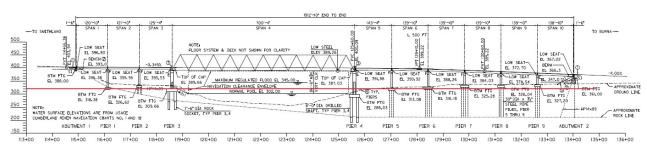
Bridge Profile Showing Water Surface Elevation EL. 320.0
